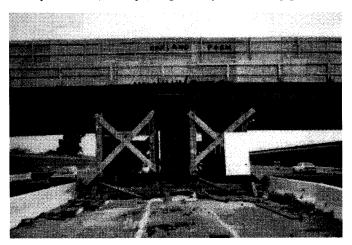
Heavy Timber Post Falsework Used on Low-Level Bridge
